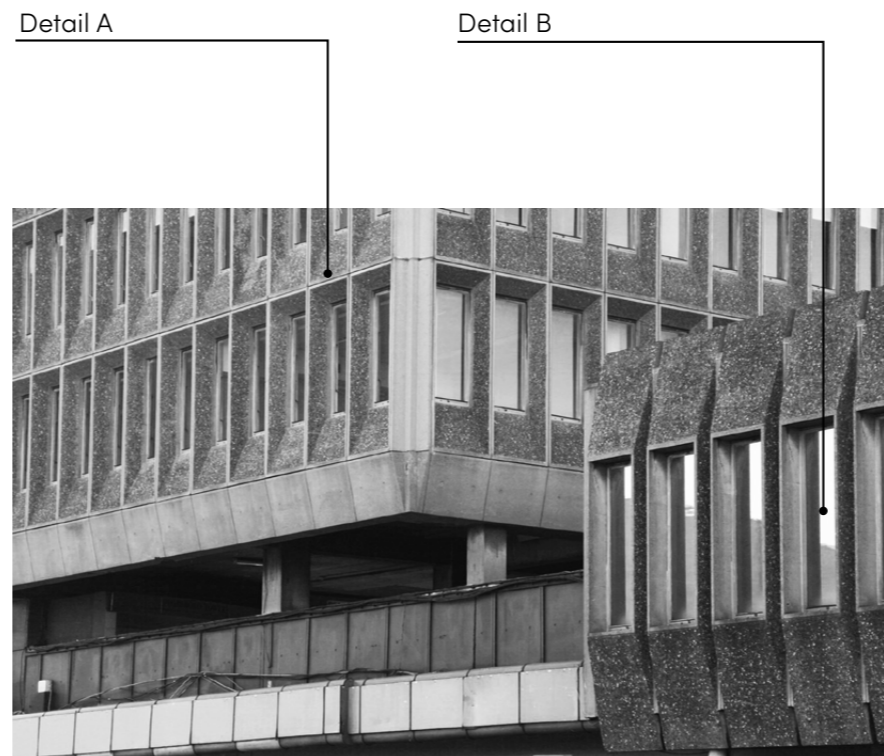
Façade zoom-in of Phibsborough tower and annex.
